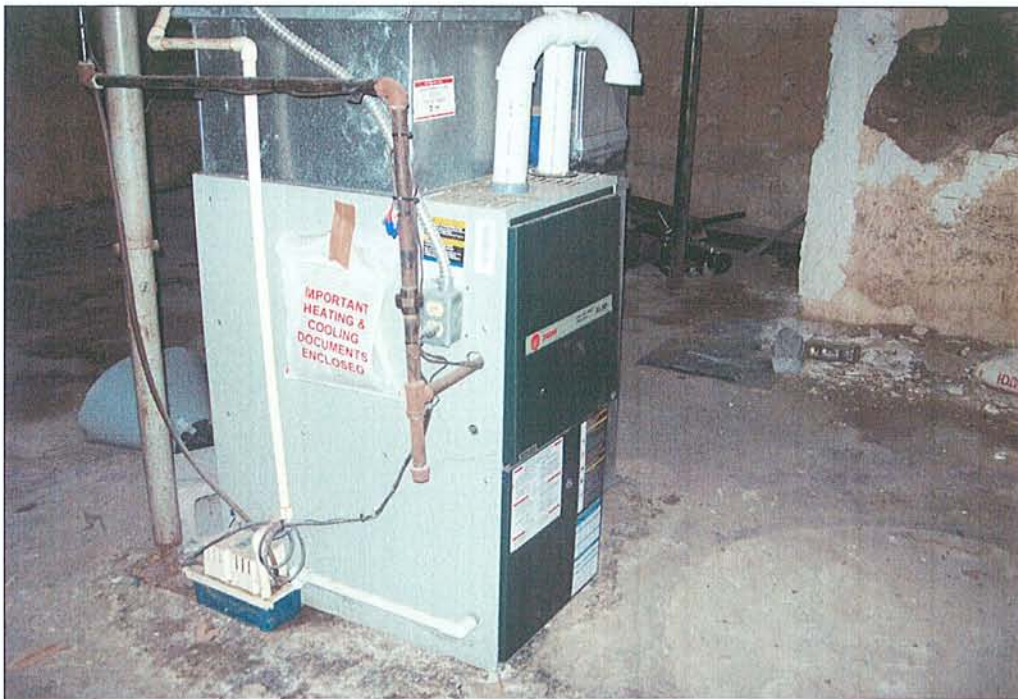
Typical air-forced furnace, located in the basements of the dwellings.
